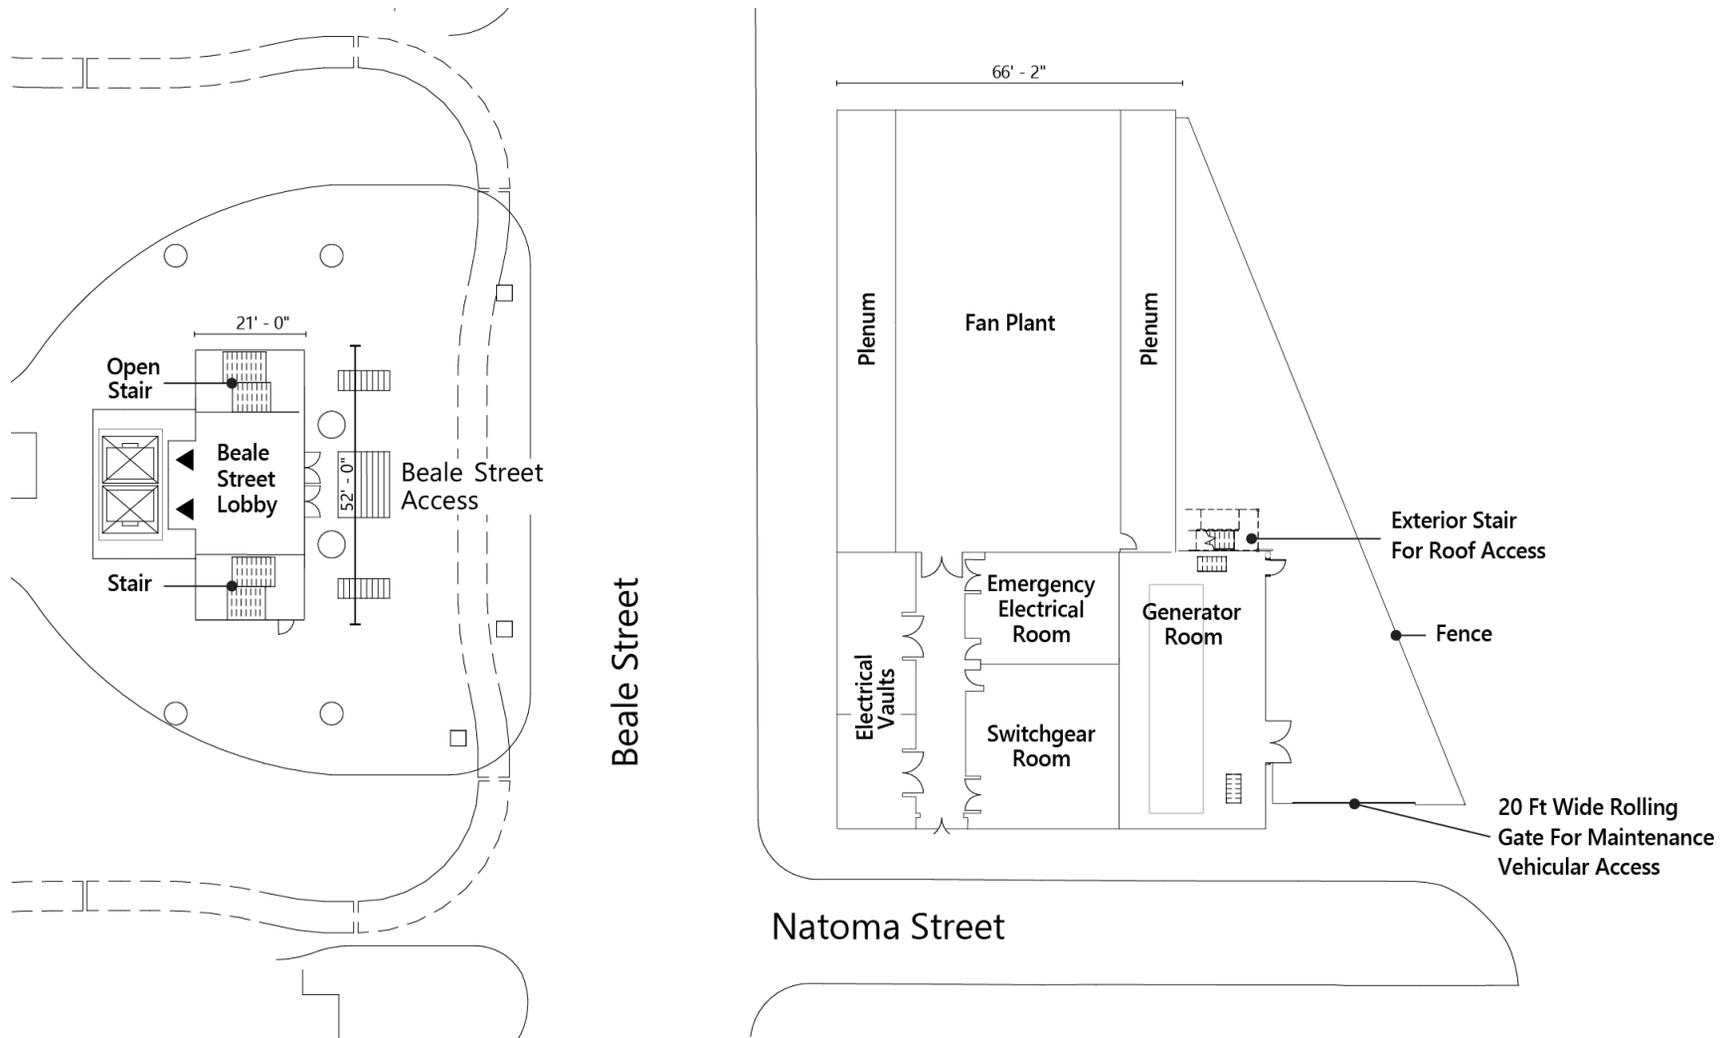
Proposed At-grade Utility Building and Modified Public Lobby
